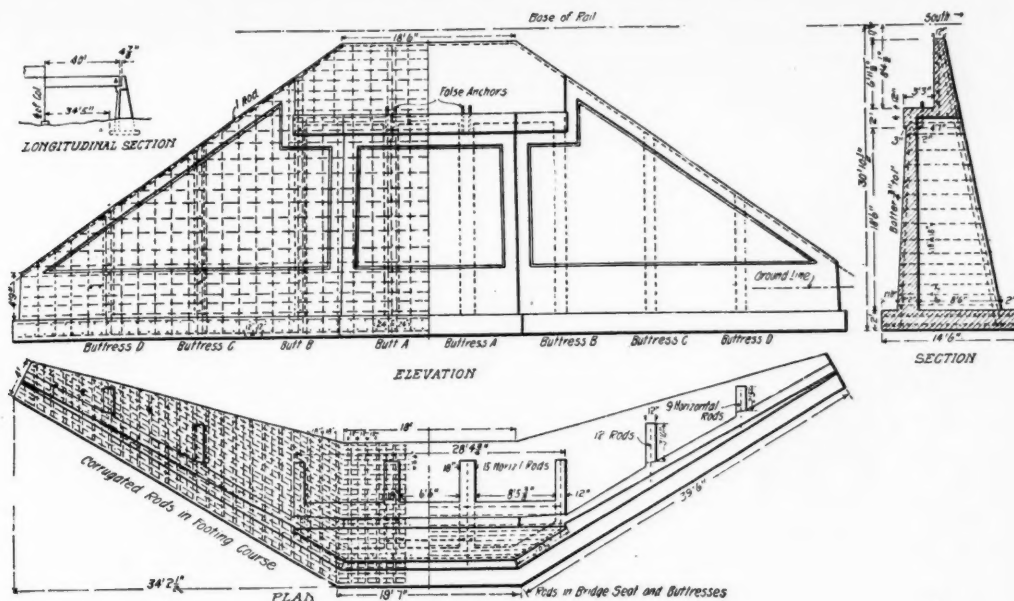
DETAILS OF REINFORCED CONCRETE ABUTMENT AT SOUTH END OF MONTICELLO VIADUCT, WABASH R. R.
